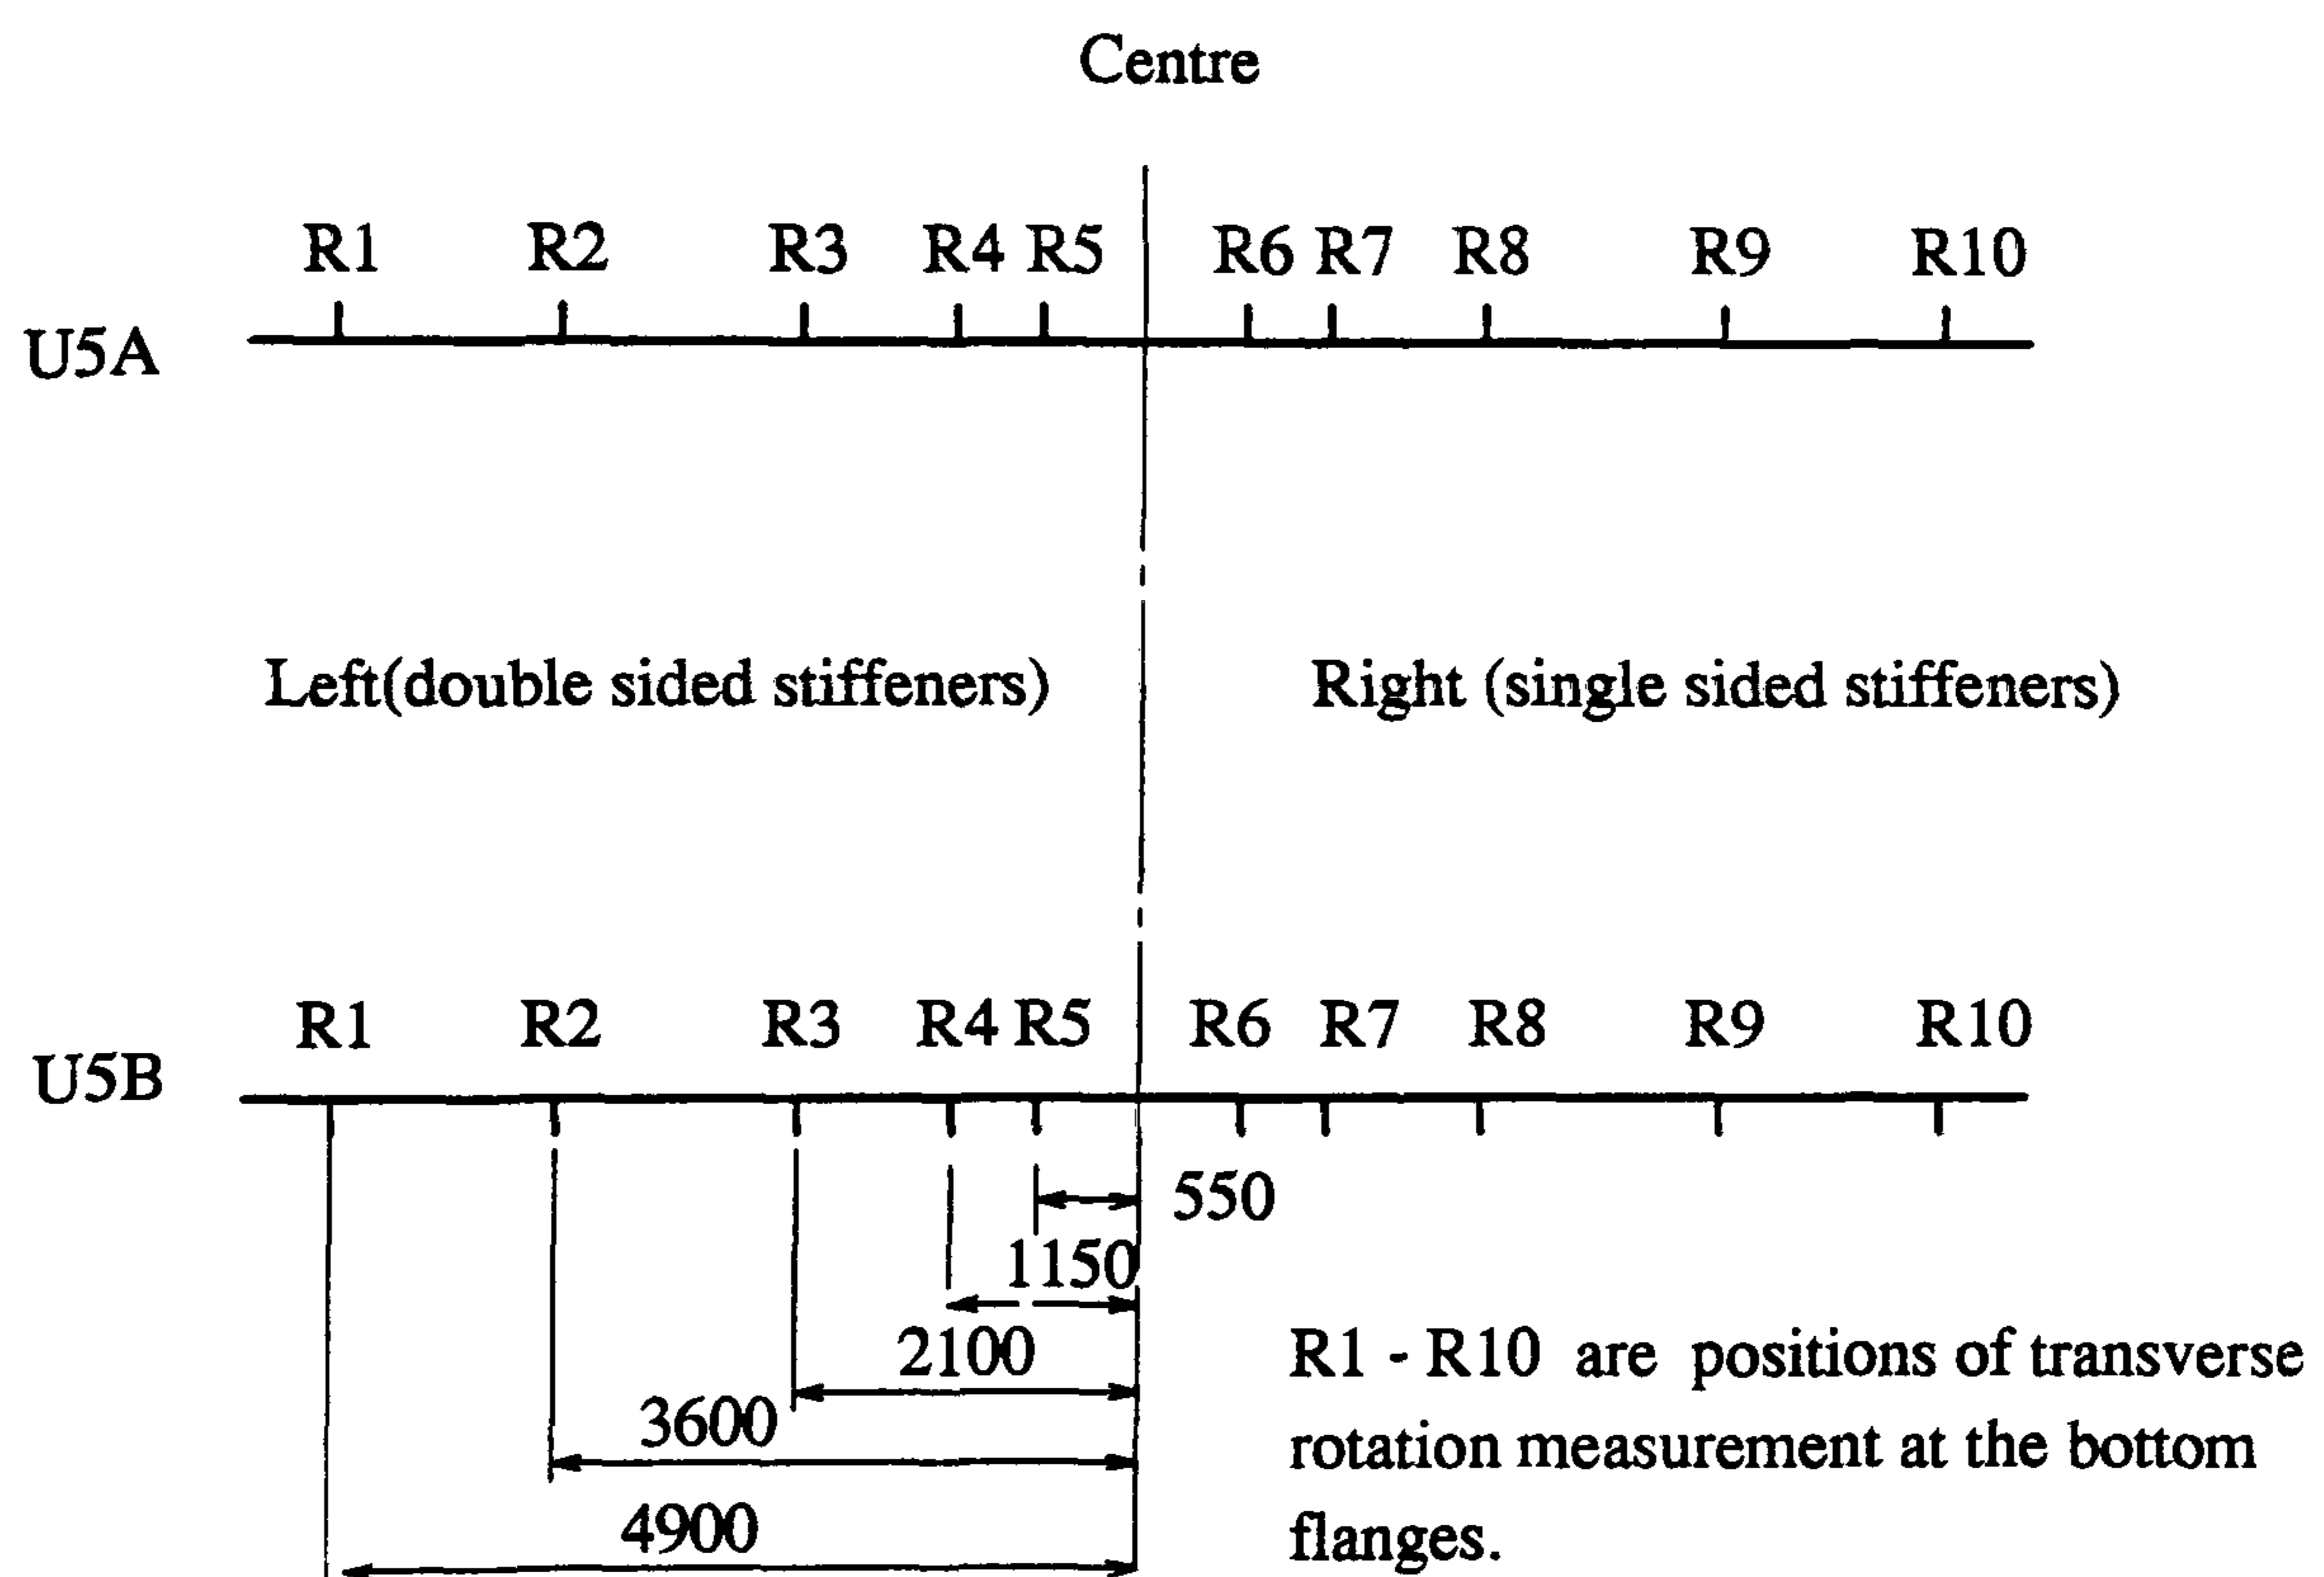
Positions of R1-R10 in the bottom flanges (specimen U5)
